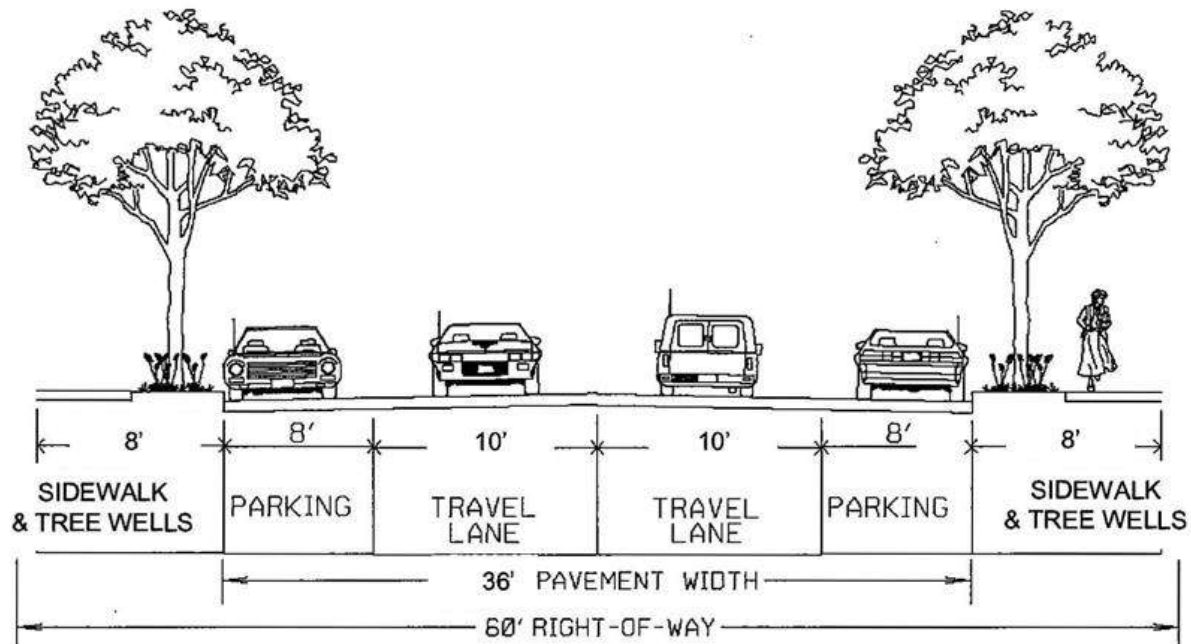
Existing Cross-section Standards for Minor Collector Roadways.
